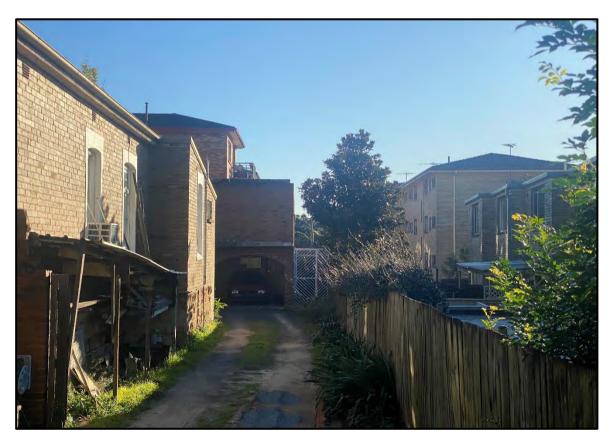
Rear (western) – Willoughby Lane elevation of properties at No. 82 and 84 Alexander Street
